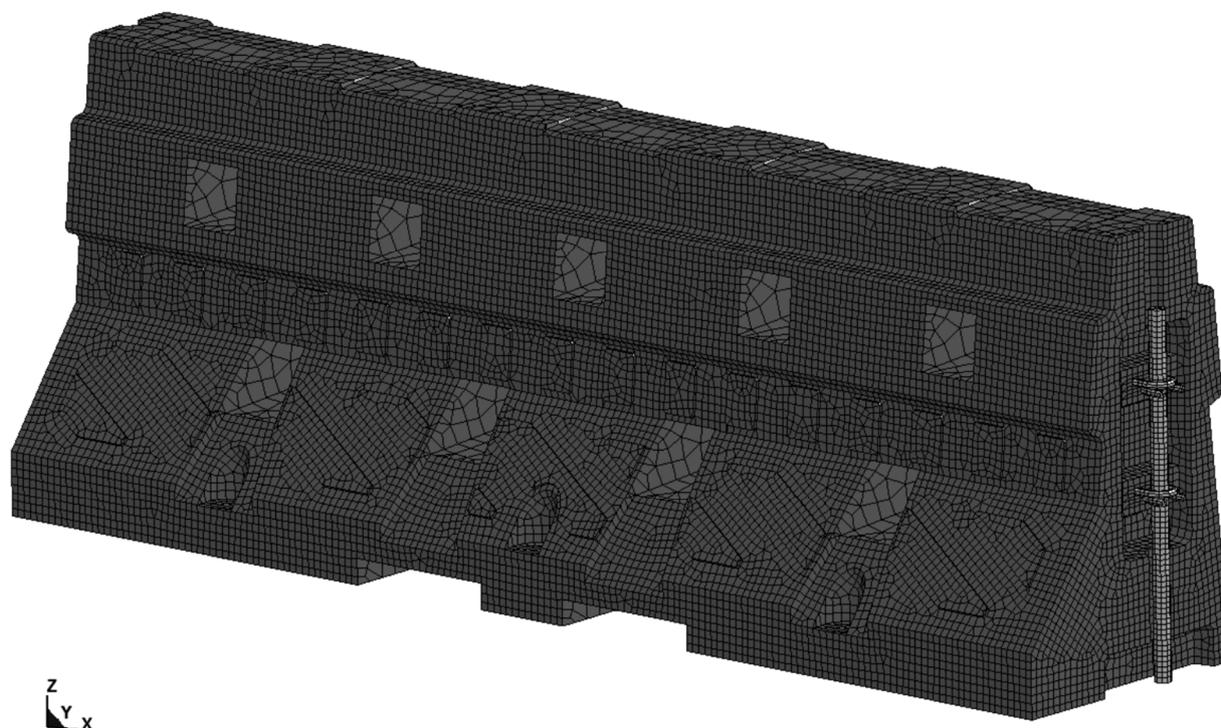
A view of a non-deformable barrier with reinforcement bars and a bolt
